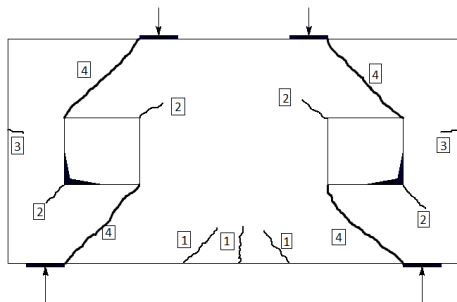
Idealized cracks in deep beams with web openings.
